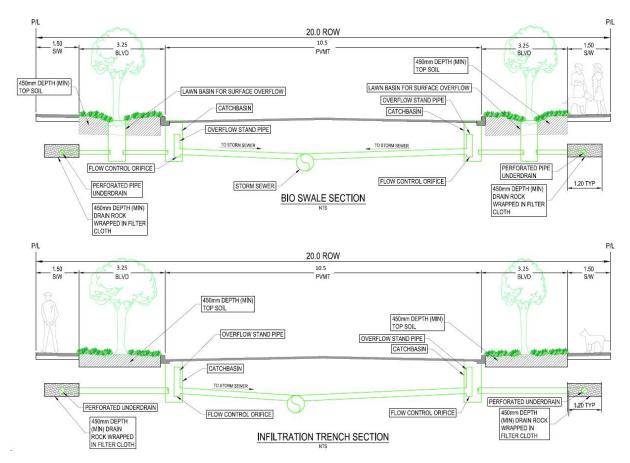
20 M Road Right-of-Way Bioswale & Infiltration Trench Cross-sections
